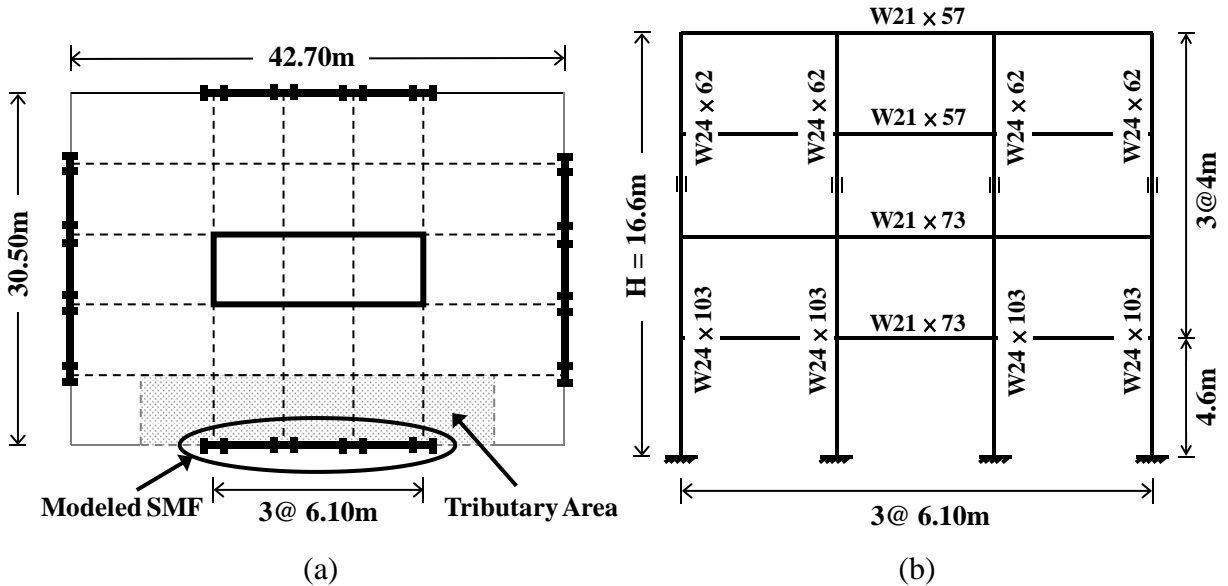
(a) Plan view of the four-story building; (b) elevation view of the modeled SMF
